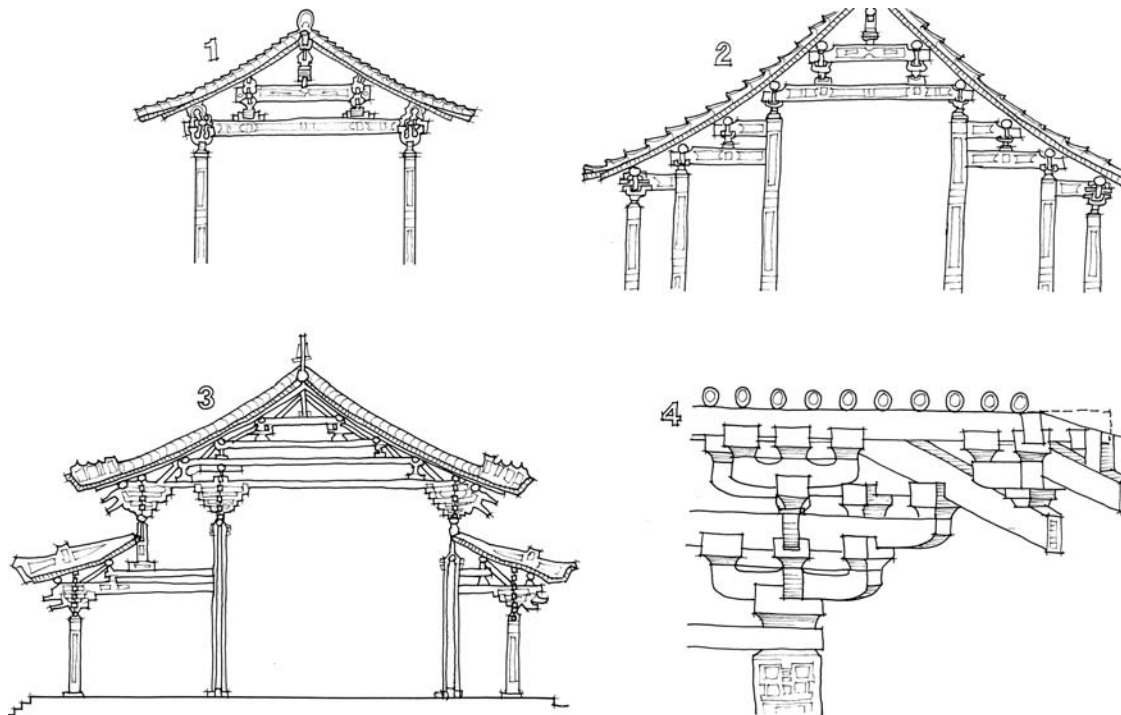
The evolution of Chinese roof construction shows that the early designs consisted of (1) narrow eaves and span. To increase the size of a building, more pillars are added (2), which caused the interior to become cluttered. A system of brackets (3) was then developed that would reinforce the structure and open up the interior space. Beginning in the eighth century, cantilevers were designed to fit within the brackets that supported more brackets (4).
